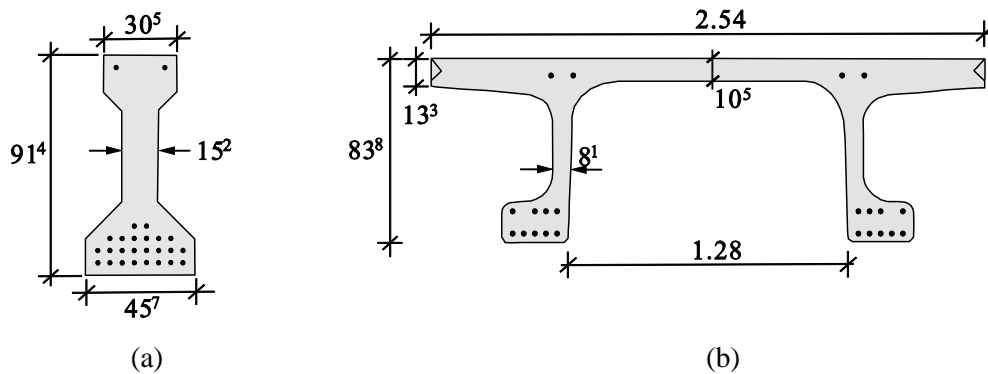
Cross-sections of precast pre-tensioned UHPC: (a) I-girder [Graybeal 2008] and (b) Pi-girder [Graybeal 2009]
